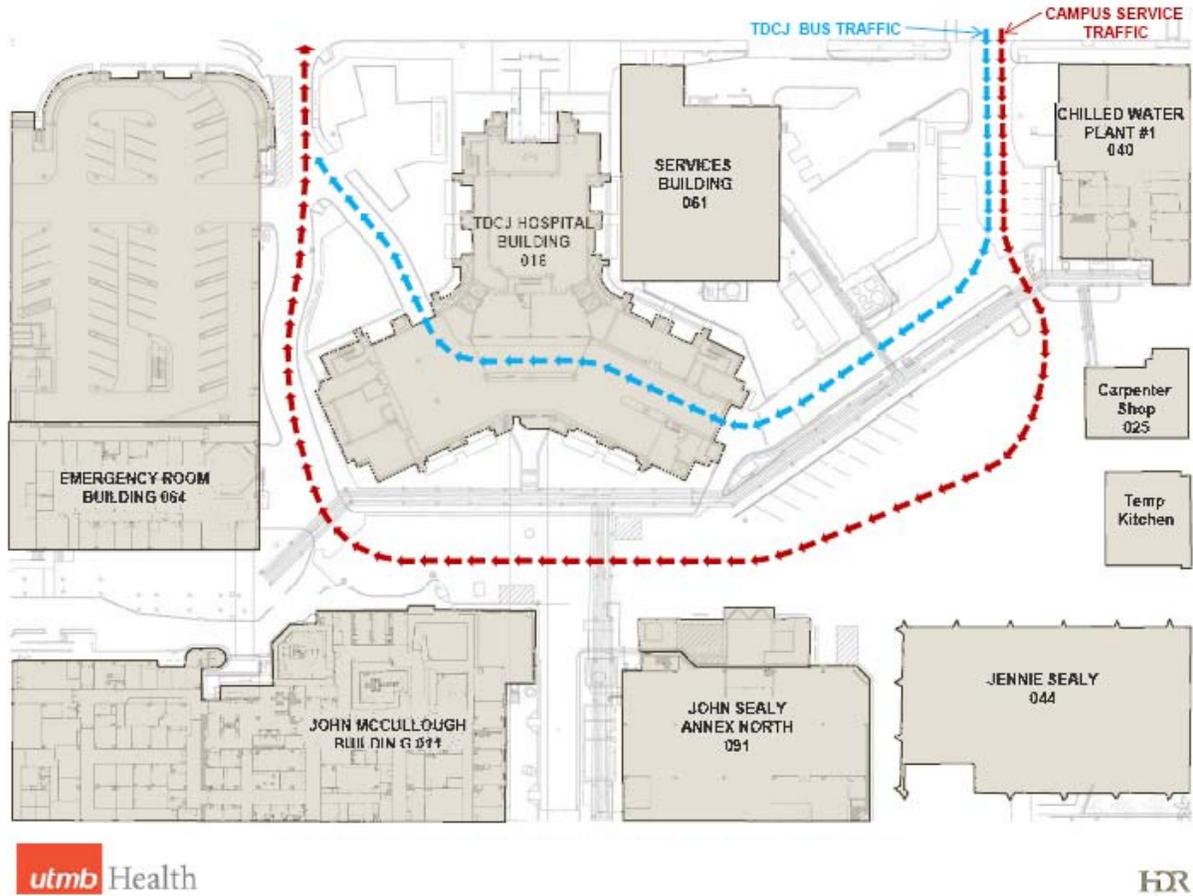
Existing Service Yard Plan – Traffic Flows
